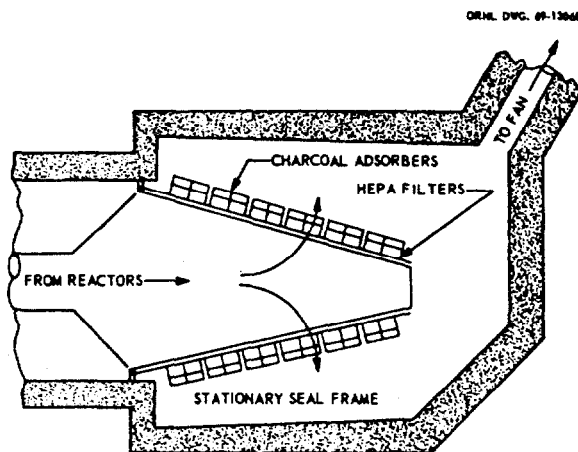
Plan view of the bypass filter pit at Brookhaven National Laboratory. Each stack of eight HEPA filters and charcoal adsorbers is clamped to a removable mounting frame that in turn is clamped to the stationary seal frame, as shown in Fig. 9.2.
